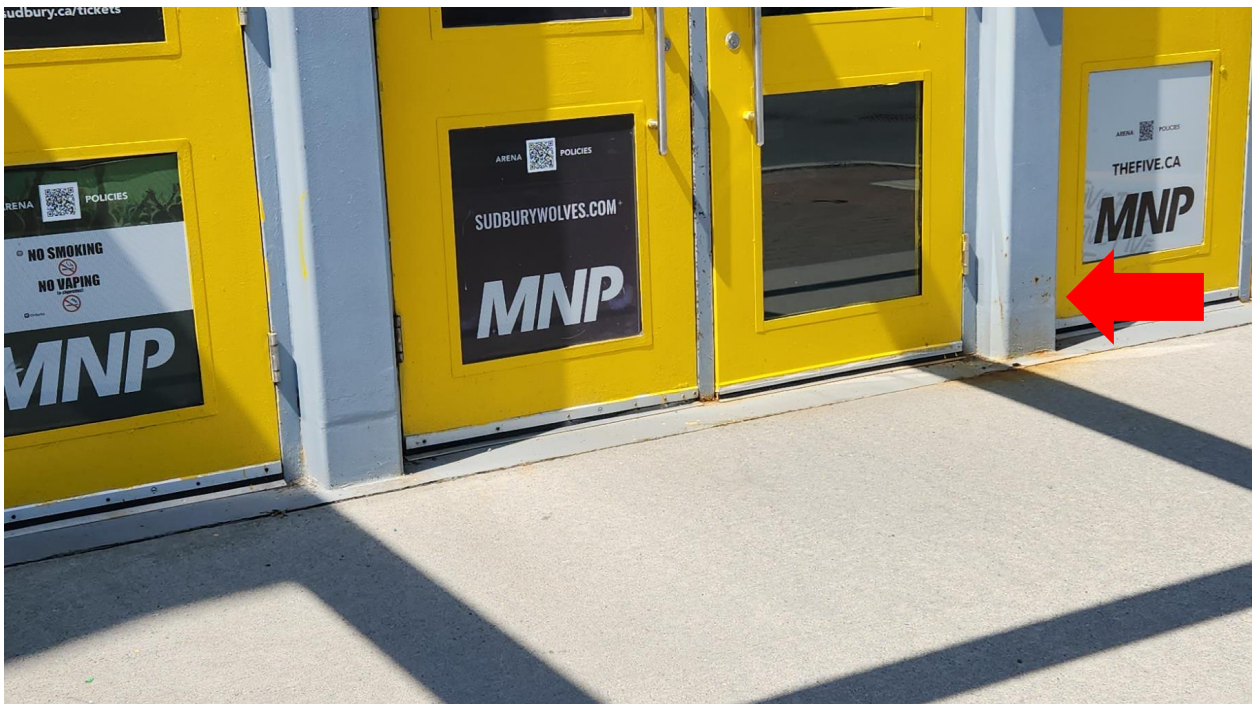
Evidence of continued corrosion to exposed steel columns at the northeast stair addition (c.2000).
